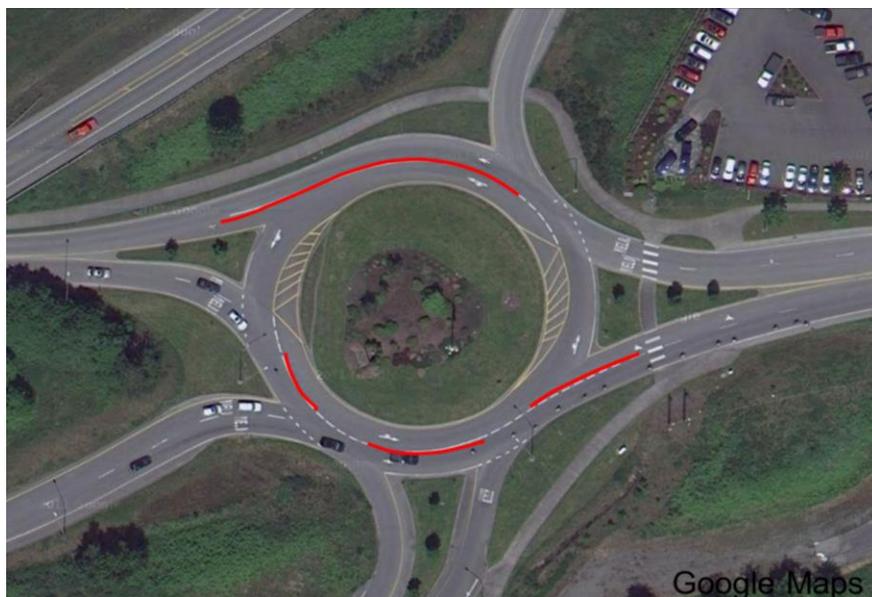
Tester Road Roundabout Constructed 2001, Monroe, WA
